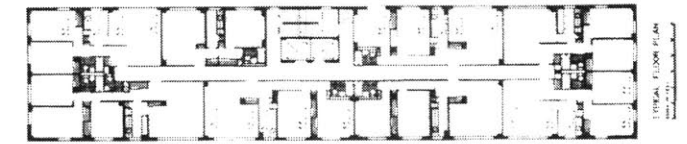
Prototypical building plan for public housing, New York City, 1951. Skidmore, Owings and Merrill.
